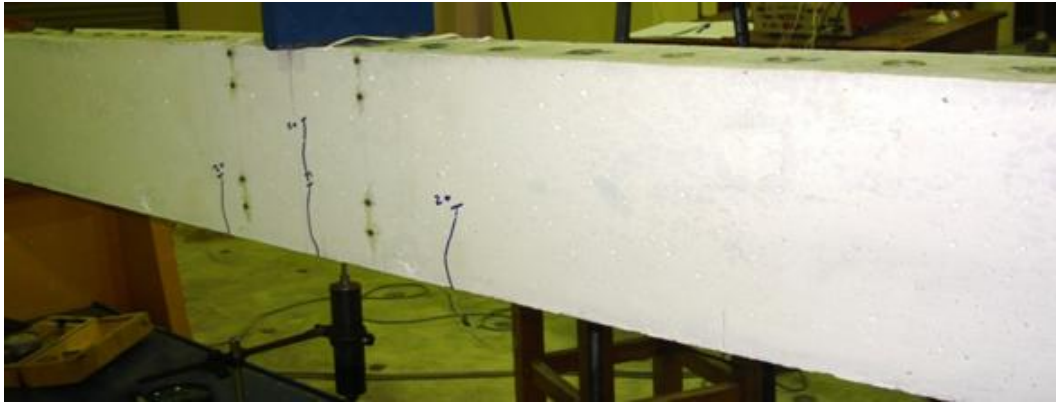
Actual crack pattern at second damage level for beam B121_m
